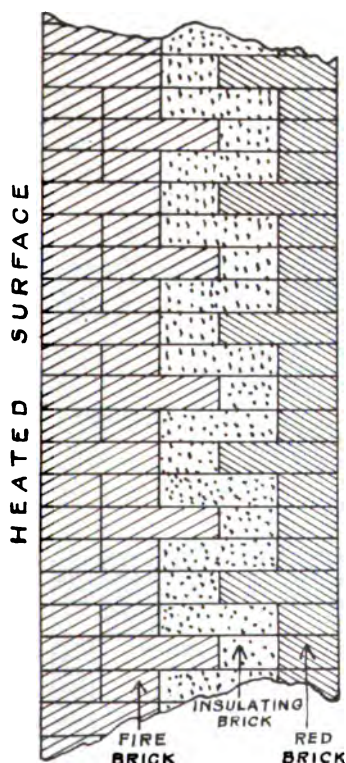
TYPICAL WALL CONSTRUCTION, SHOWING INSULATING BRICK LAID IN WALL.
